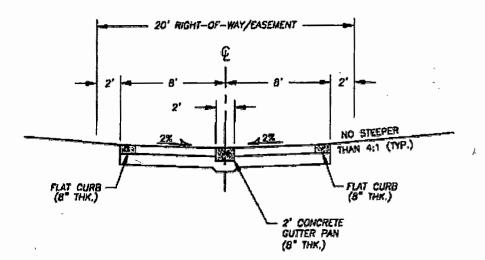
Narrow Lot Alley Cross-Section
